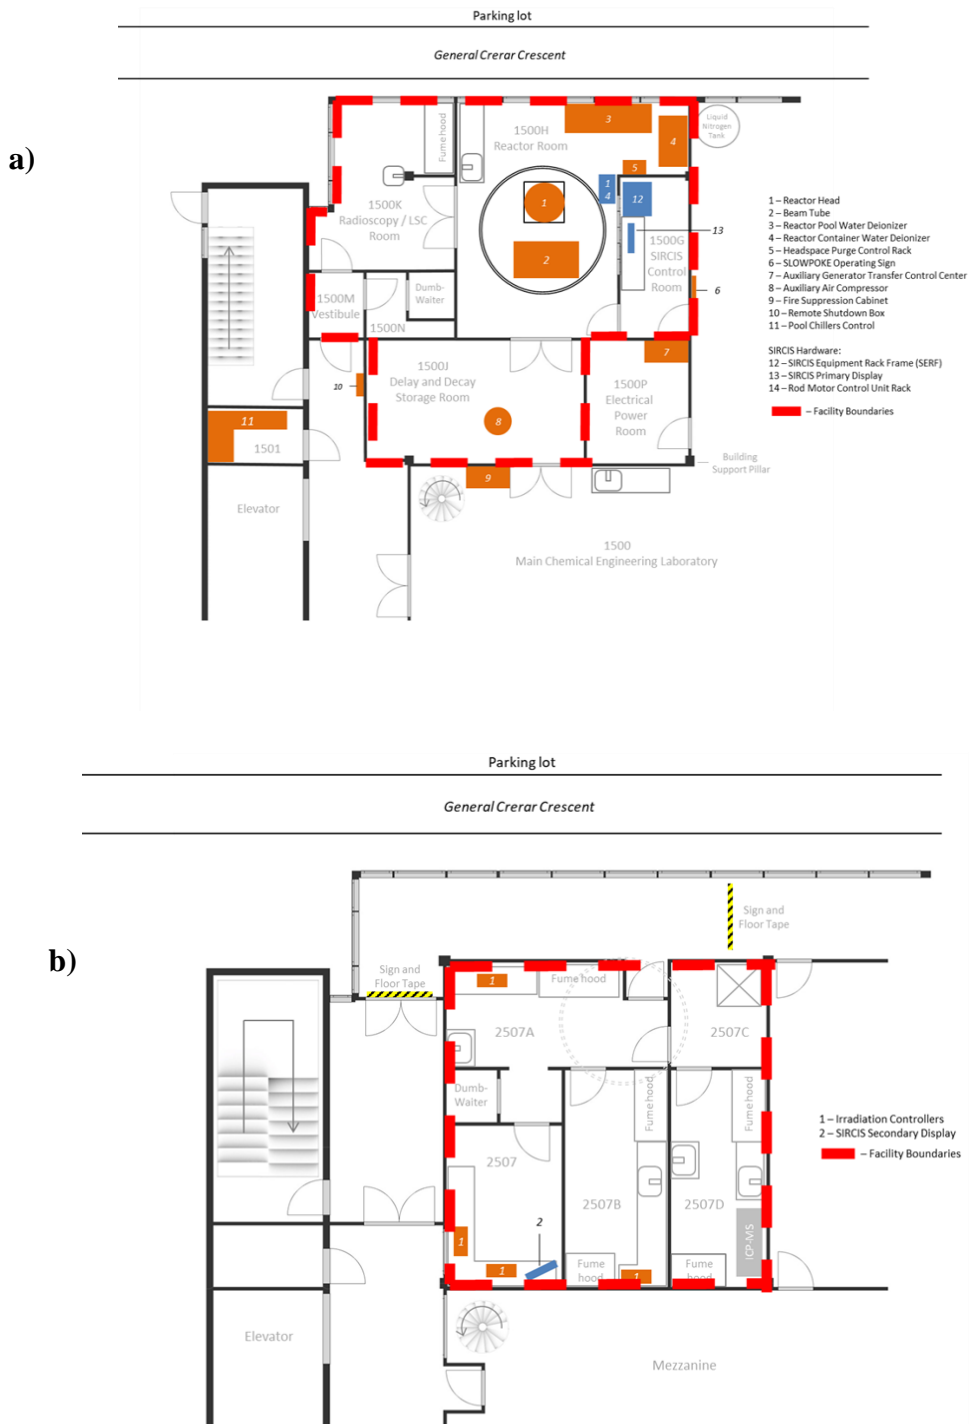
Plans of the first (a) and second (b) floors of the SLOWPOKE-2 Facility at RMC, 2022
